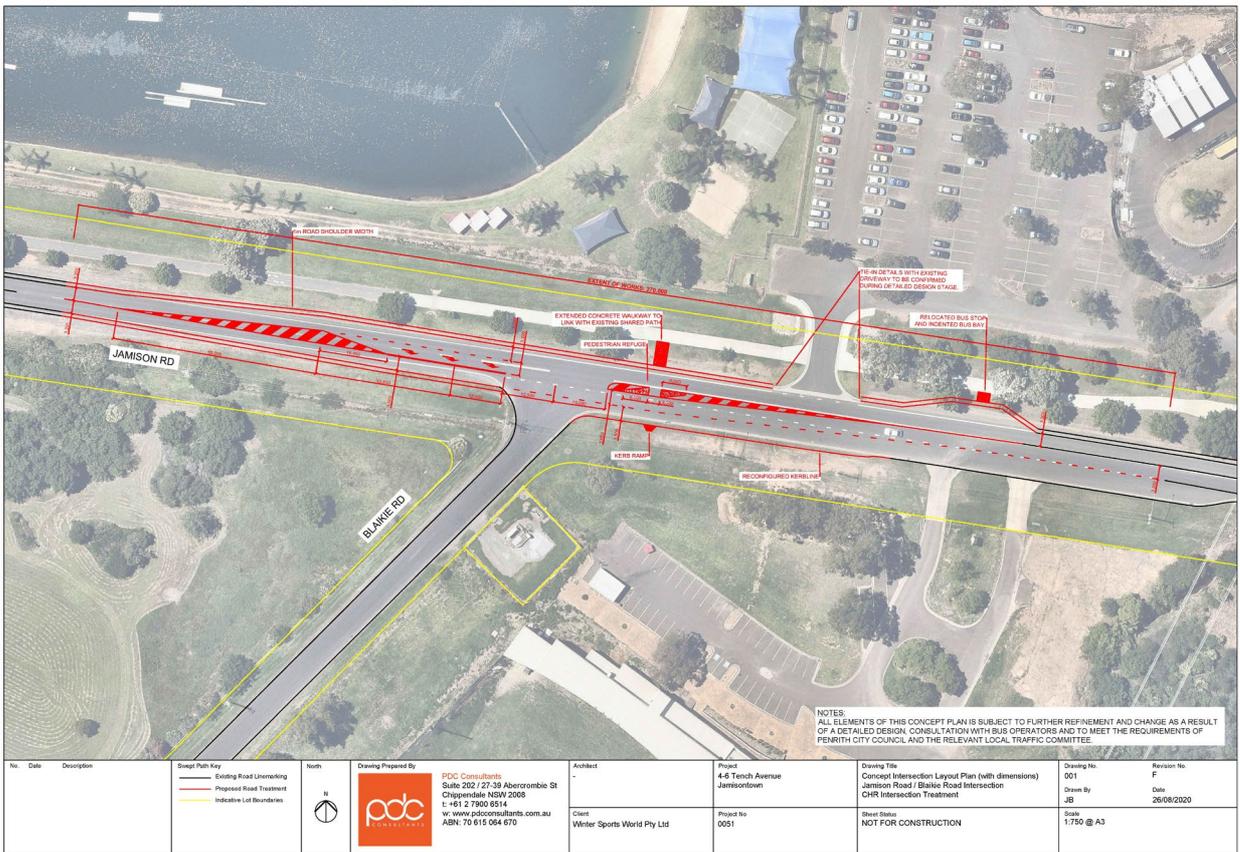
Upgraded layout of the Jamison Road and Blake Road intersection with the CHR treatment
